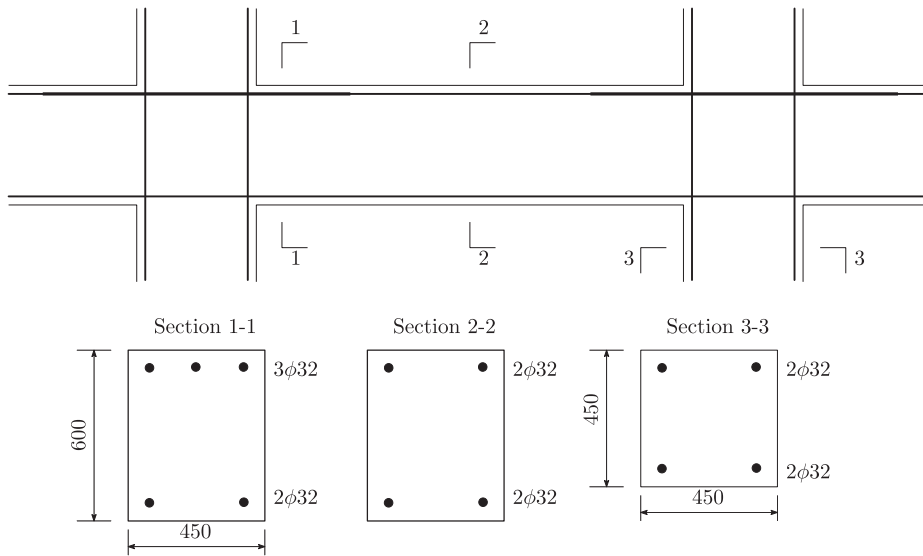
Cross sectional reinforcement details (dimensions in mm).
